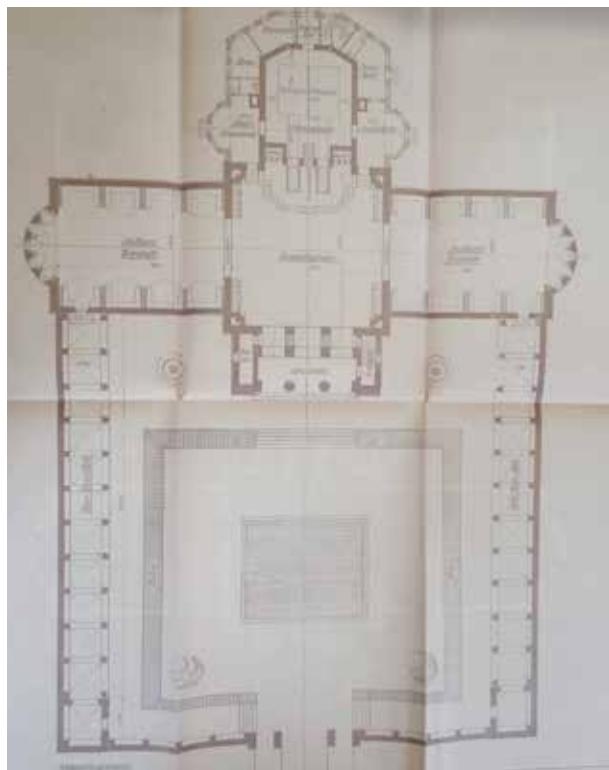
New Crematory Floor Plan. Archive Stadt Zurich (1915). [Plan]
